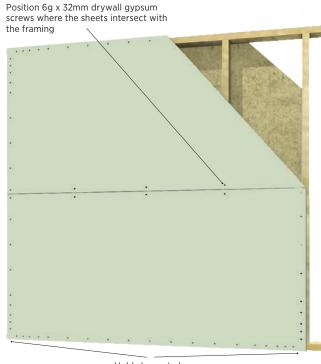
UBMP BRACING SYSTEM WITH SHEETS INSTALLED HORIZONTALLY
